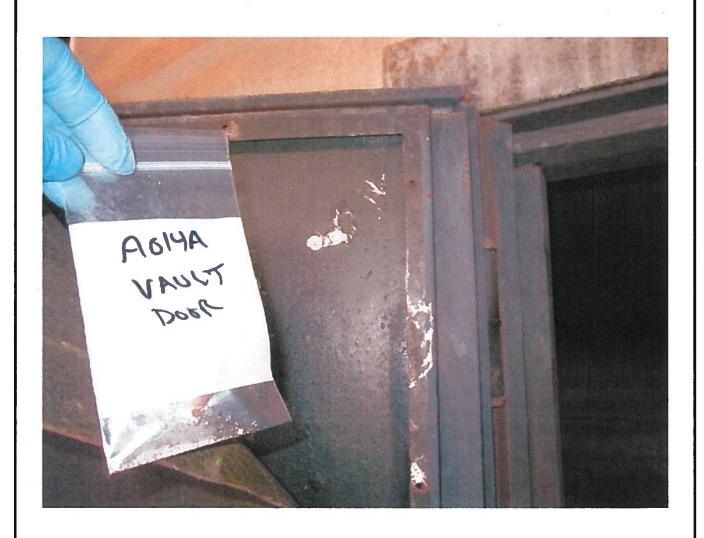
Non-ACM Vault Door Insulation Sample A-014A
